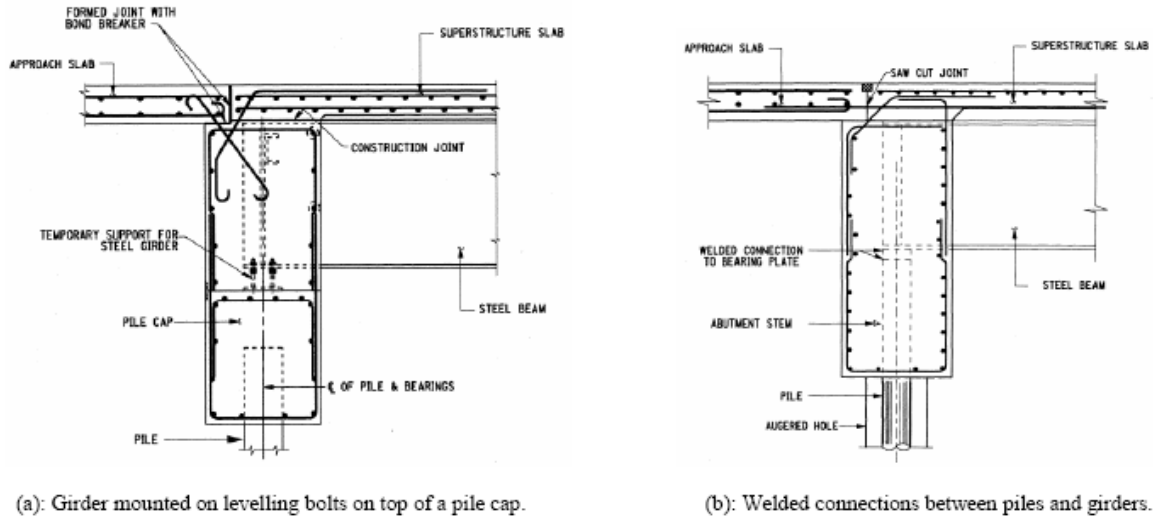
Illustrations of two different techniques of designing the pile-abutment-girder connection for steel bridges with integral abutments [21] (a) girders mounted on leveling bolts on top of a pile, (b) welded connections between piles and girders.
